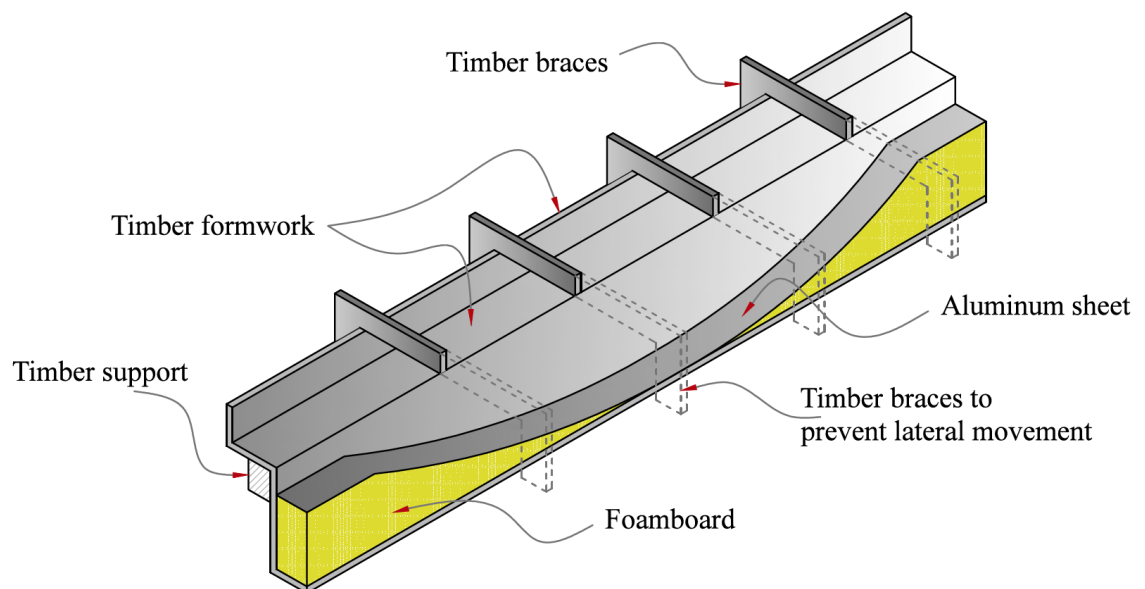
A longitudinal section of the timber-foamboard formwork
